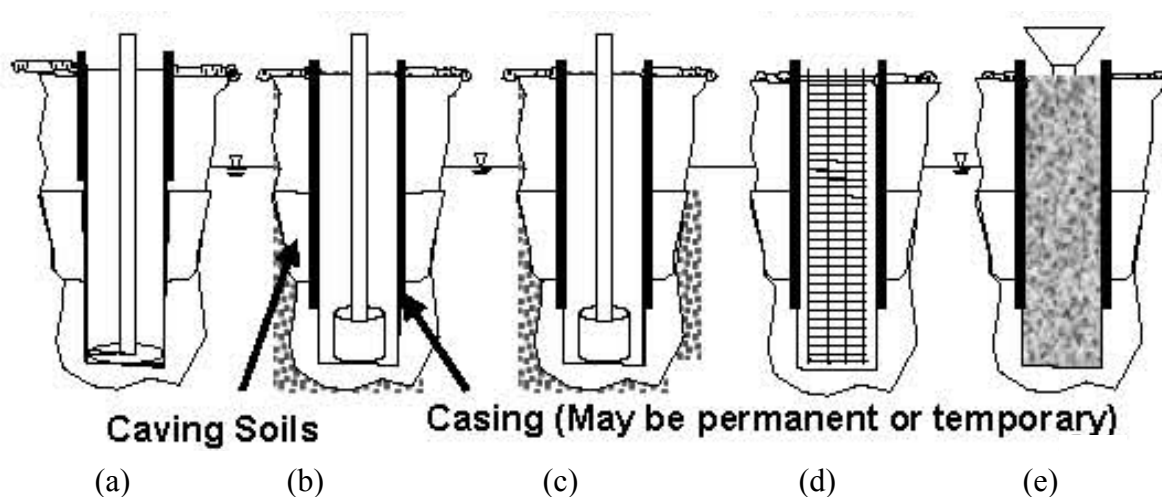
Steps in construction of drilled shafts by the casing method (a) start drilling and introduce casing in the excavation PRIOR to encountering the known piezometric level and/or caving soil, (b) advance the casing through the soils prone to caving, (c) clean the excavation, (d) position reinforcement cage, and (e) place concrete and remove the casing if it is temporary.
